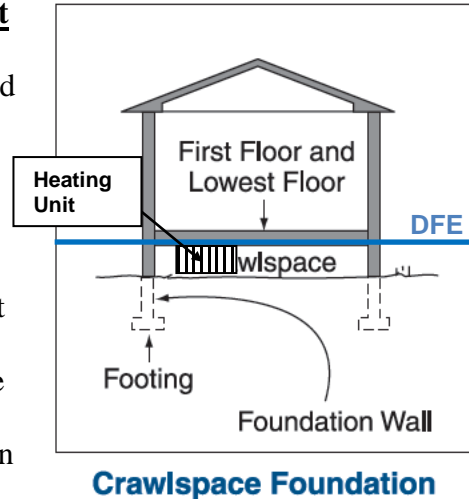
Example of Mechanical Equipment Flooding – DFE is Design Flood Elevation (Source: FEMA P-312)
